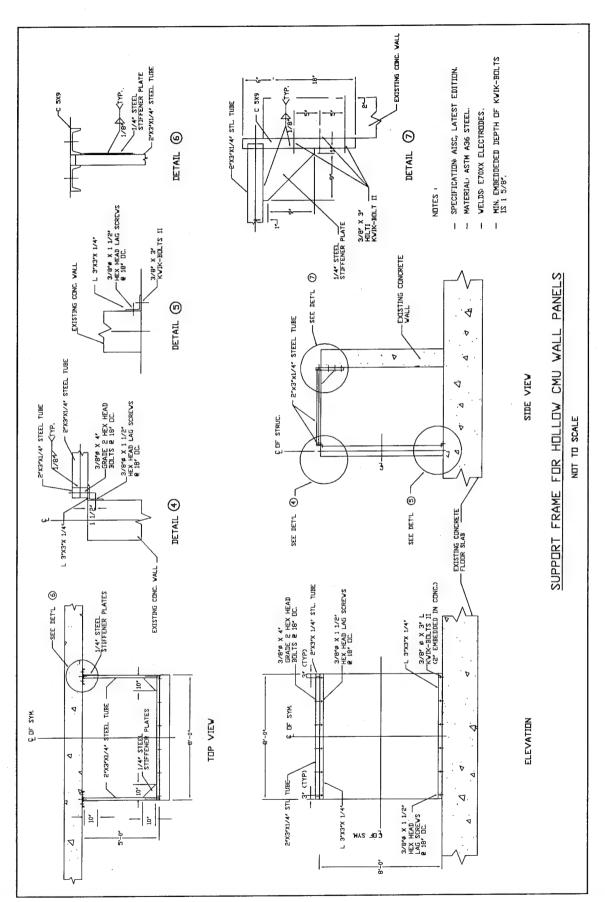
Engineering drawings for hollow CMU wall panel support frame
